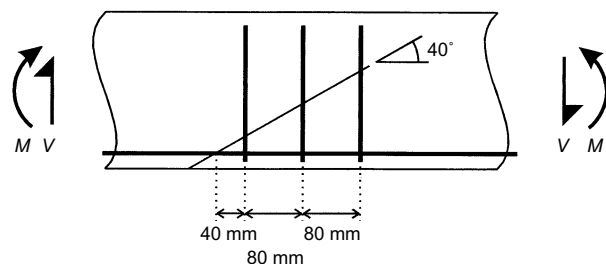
Geometry of the single shear crack example, showing the shear reinforcement arrangement
